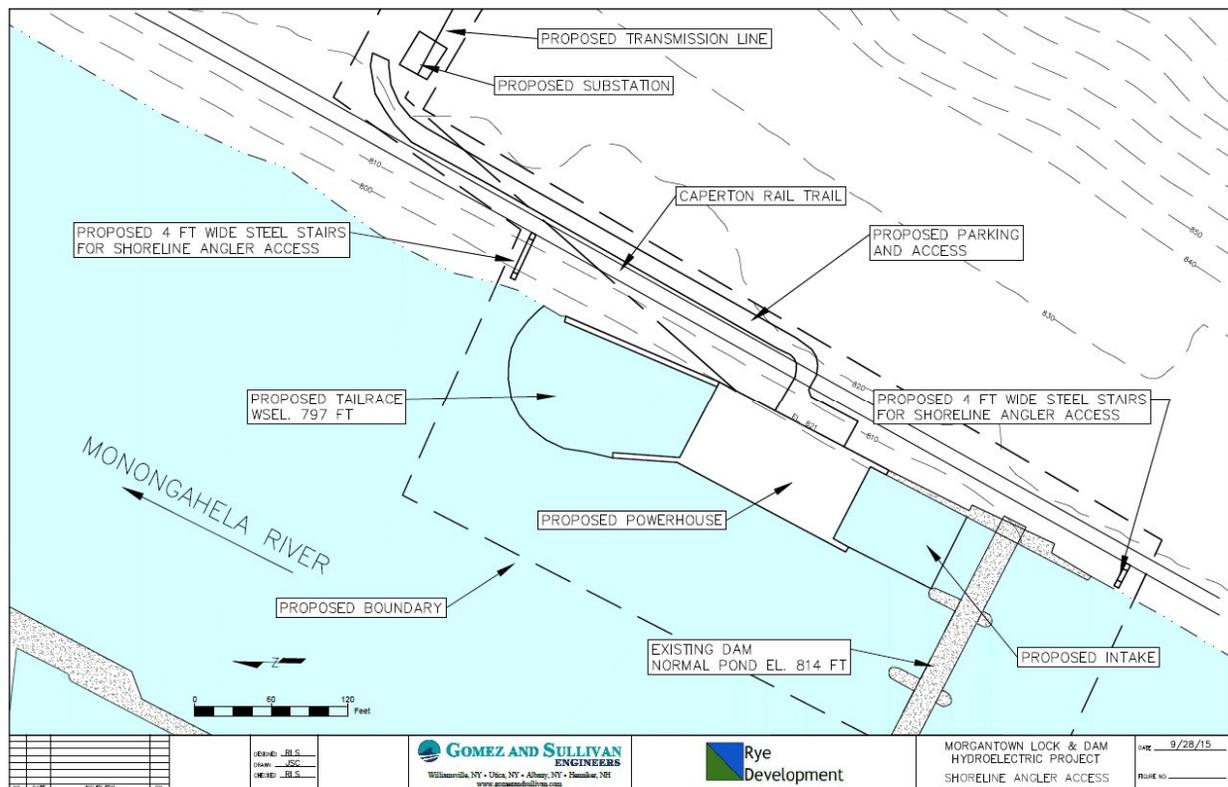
Recreation enhancement conceptual design plans, Morgantown (Source: Rye Development, 2015g).
